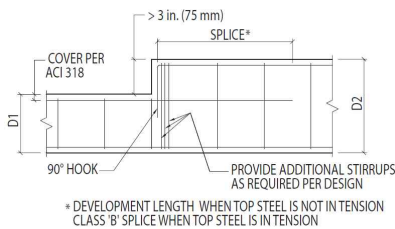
Exemplar reinforcement scheme for a large step at the top of a beam
